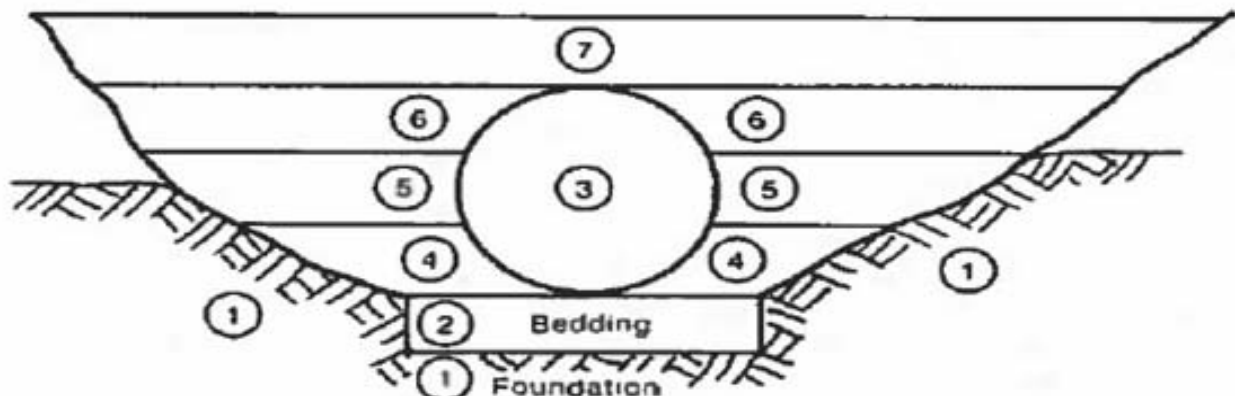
Typical inspector's document for construction control of large corrugated steel pipe structures.
